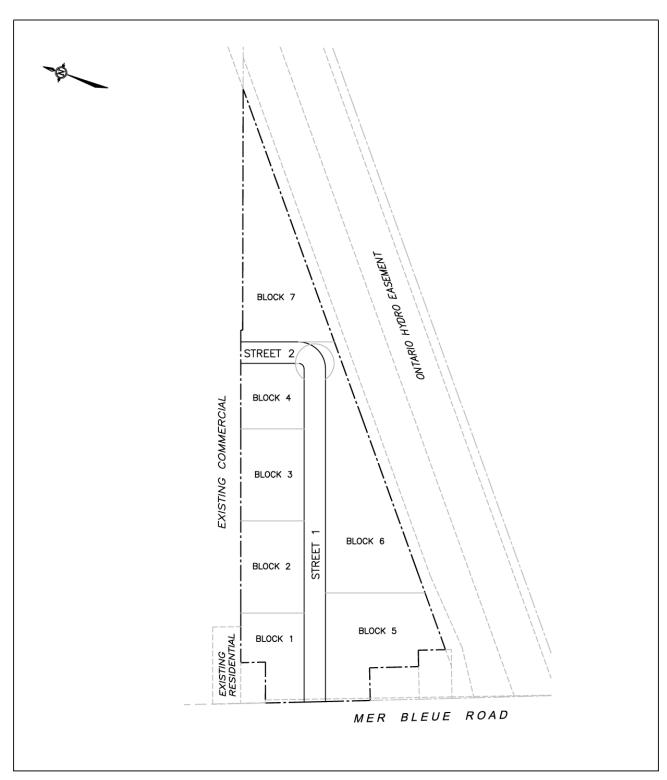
provides a concept plan of the development showing the blocks which will be developed and the proposed access points onto Mer Bleue Road and future connection to Vanguard Drive.
